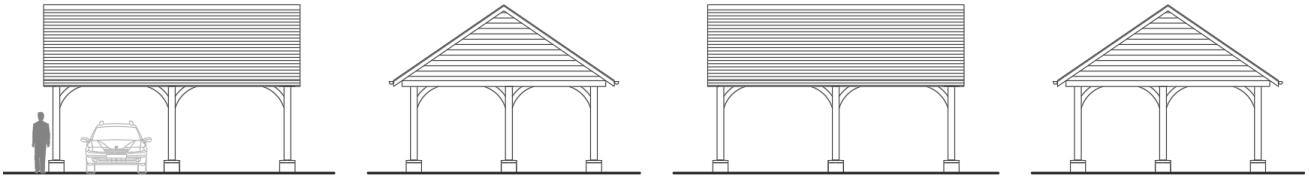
PROPOSED CARPORT ELEVATIONS
